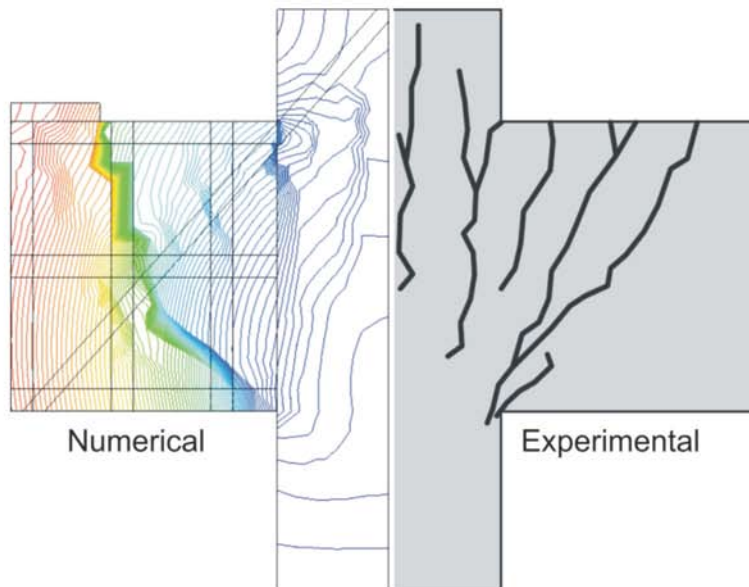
Reinforced concrete corbel. Crack patterns
